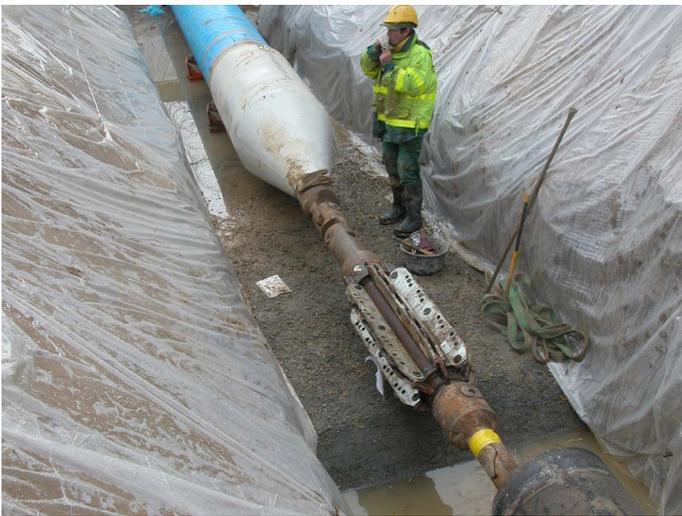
The pipe string with the 810 mm expander and the 600 mm cutting blades
